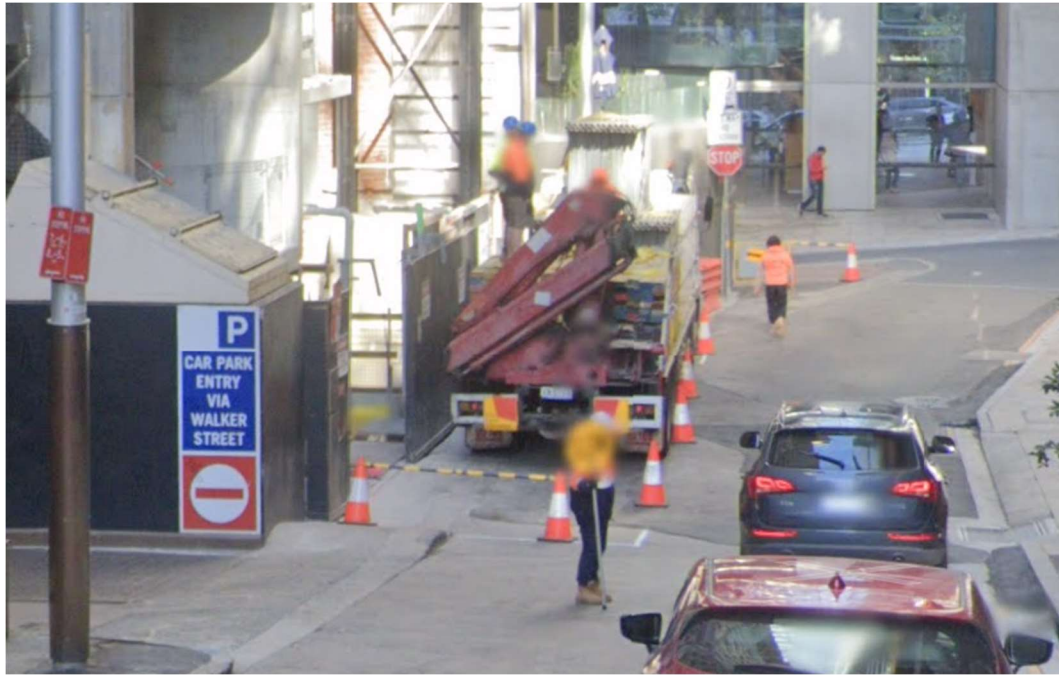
Loading zone on Little Spring Street at the 86 – 94 Walker Street development
